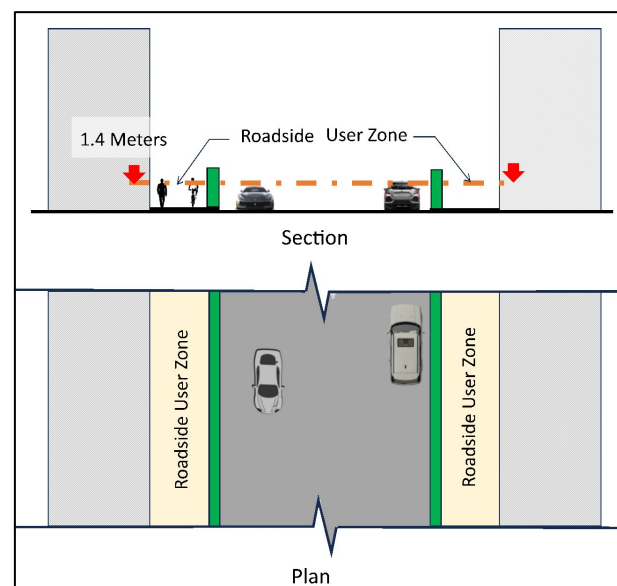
Schematic plan and section of the road model showing roadside user zone at the height of 1.4-m above the ground.
